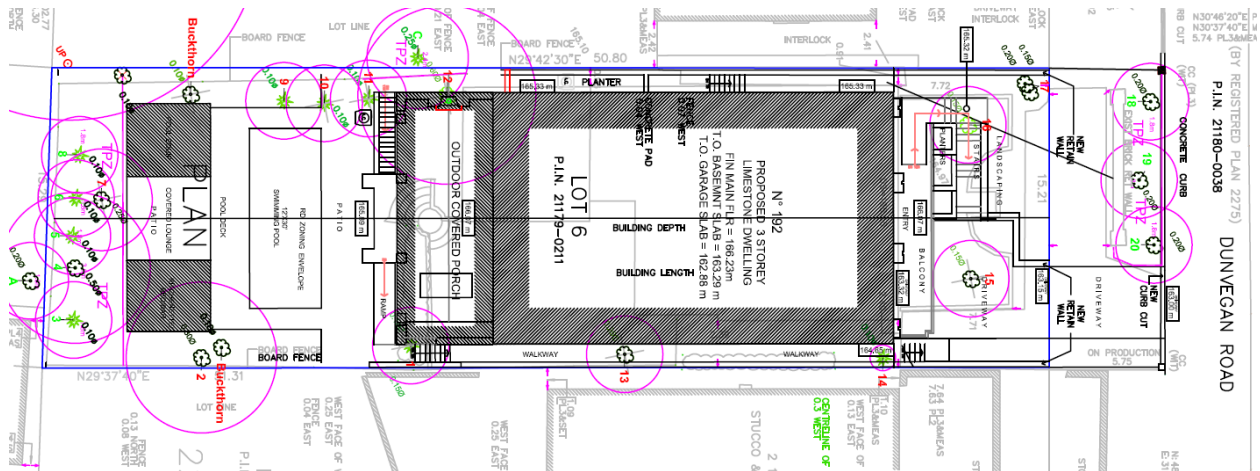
Arborists Drawing showing footprint of existing house and proposal, EX1, page 216
